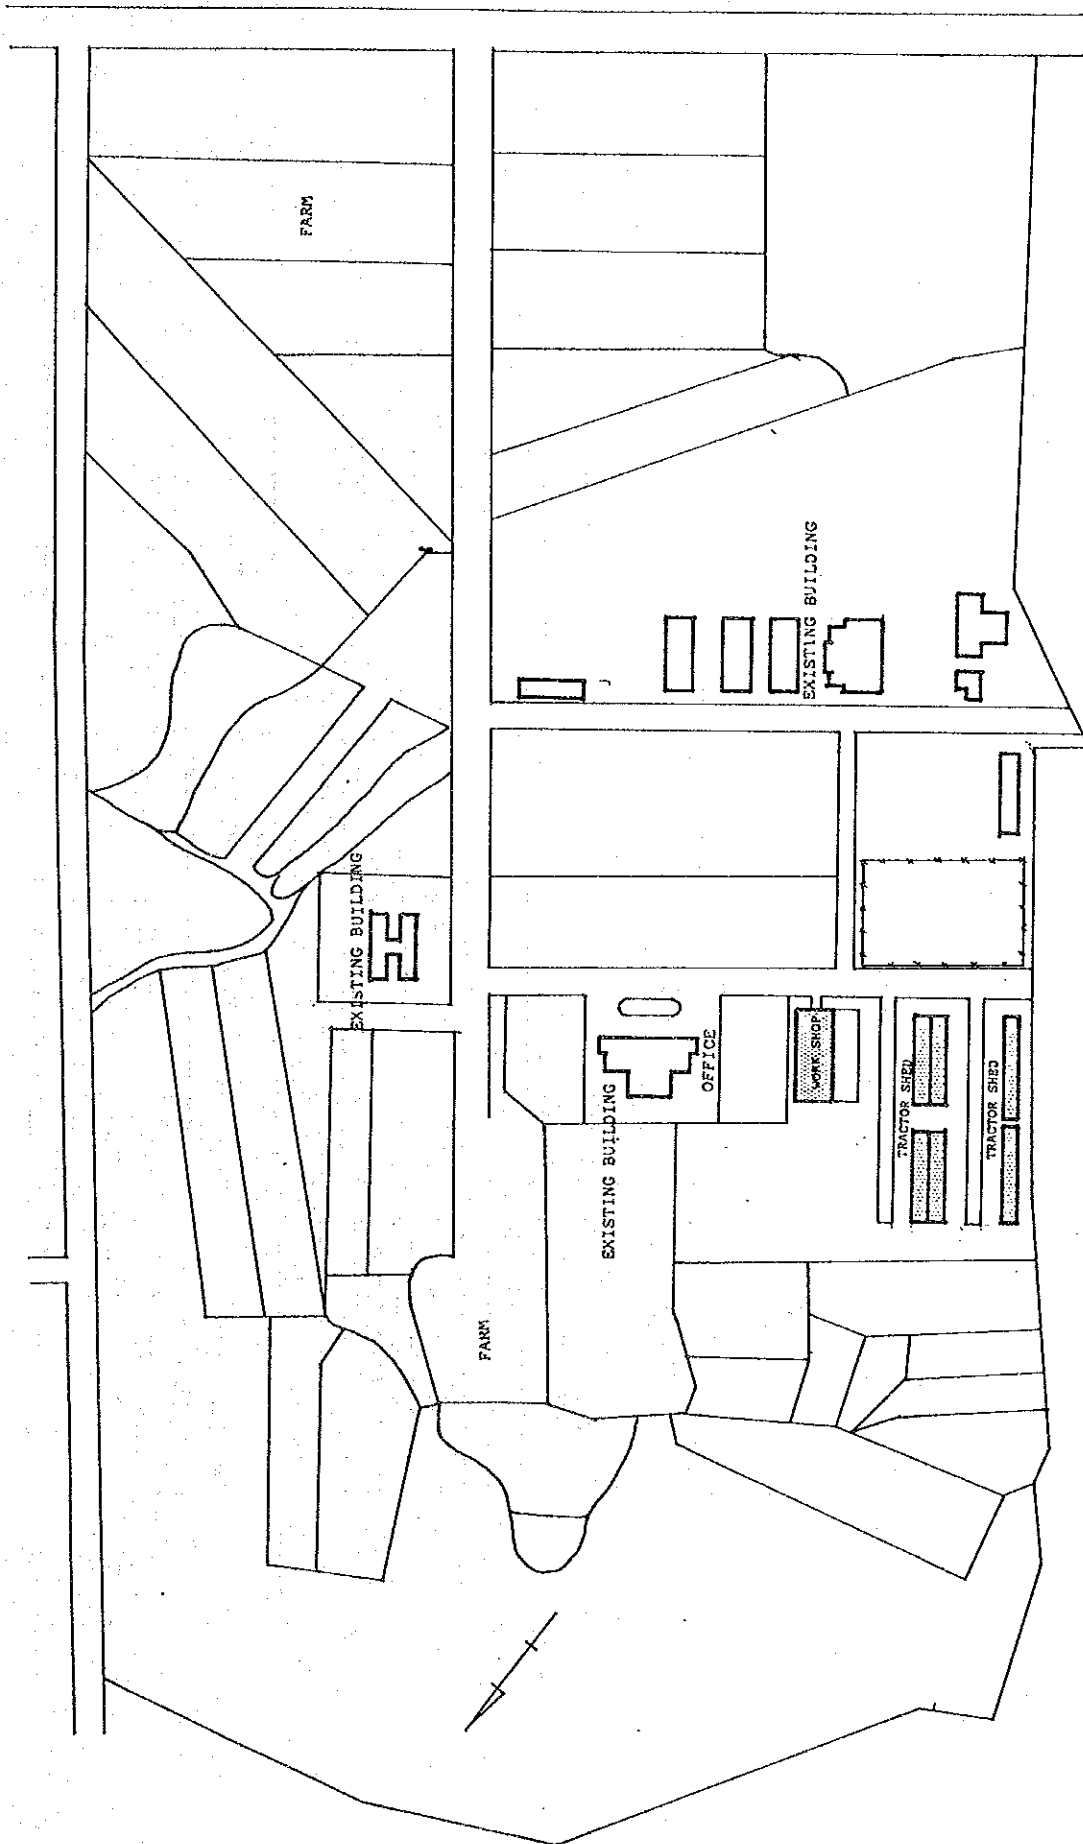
PROPOSED SITE PLAN OF AMS MAIN STATION (TARLAI MARKAZ)
